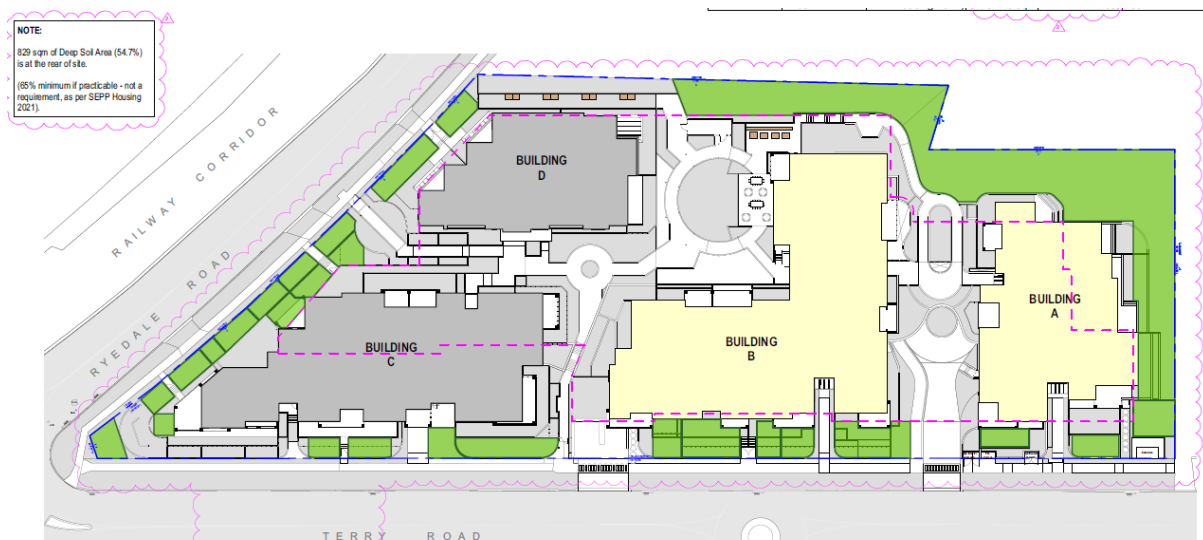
Proposed site plan depicting Stage 1 approved buildings in yellow and Stage 2 buildings in grey
